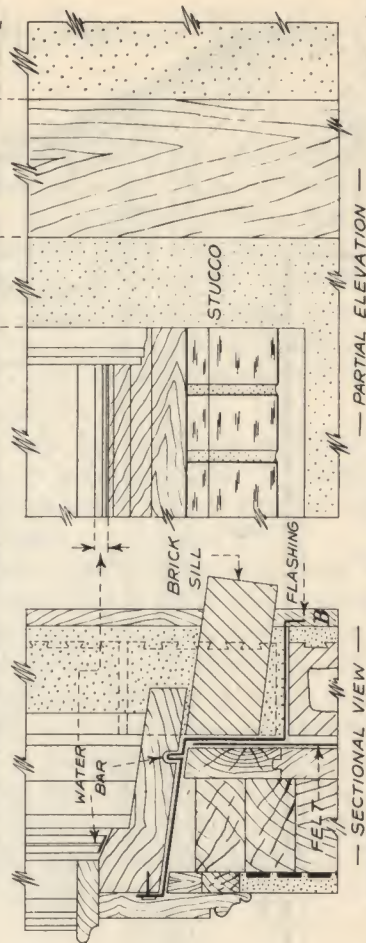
FLASHING WINDOW SILL ON HOLLOW TILE AND STUCCO WALL — SCALE $1\frac{1}{2}'' = 1'-0''$
